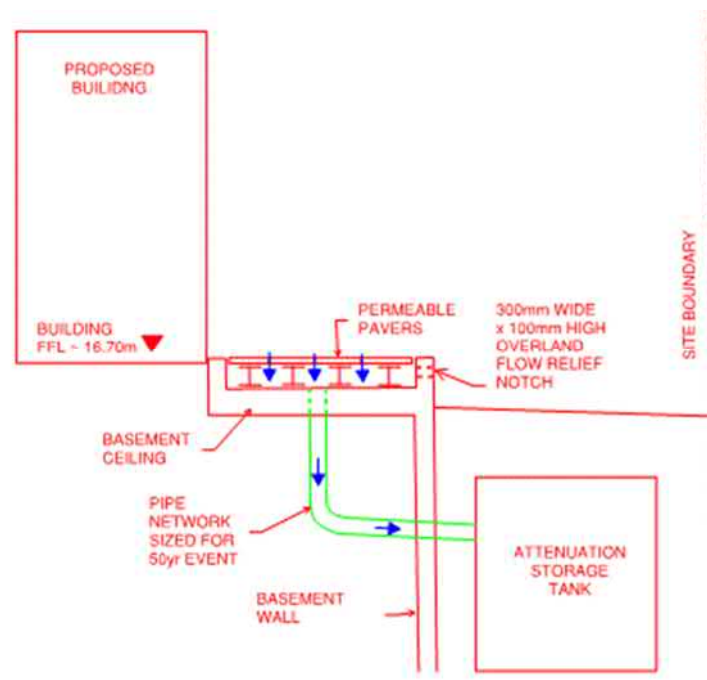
Site 1 Bishopspark Typical Cross-section of Stormwater Overland Flow Philosophy
